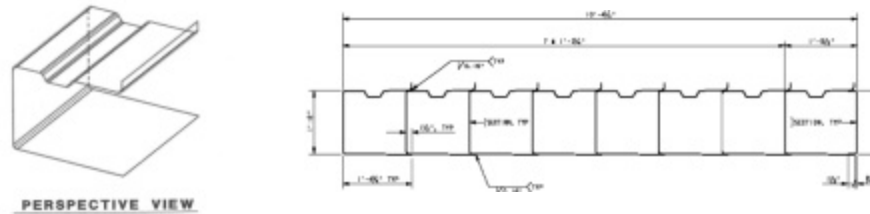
Perspective view of formed steel sections and eight such sections inserted into one another to form an MCBG module.
